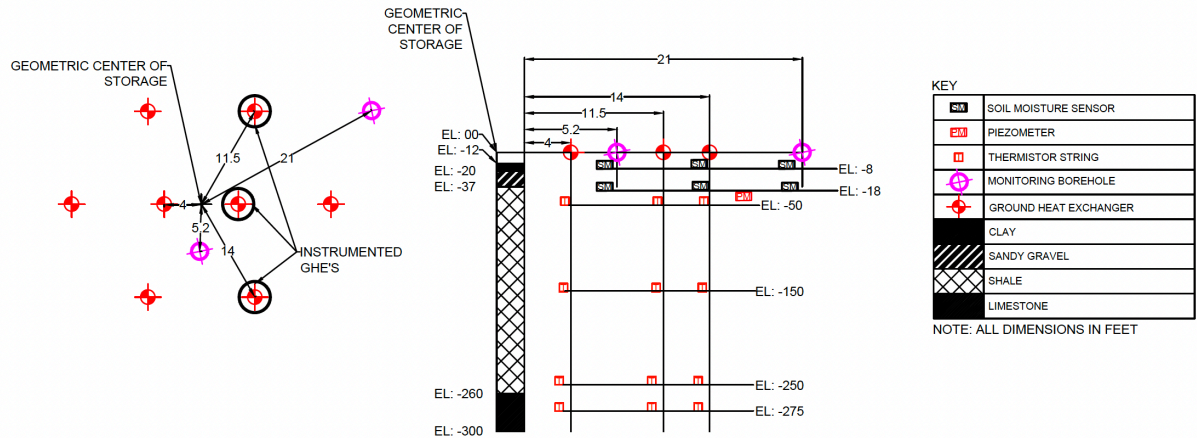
GHE instrumentation location plan view (left) and cross-sectional view (right).
